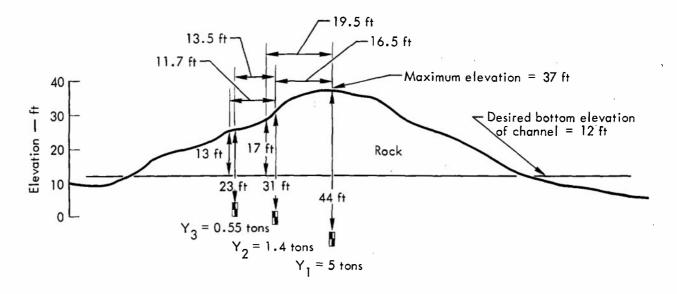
Row-charge design to excavate channel with constant bottom elevation.
